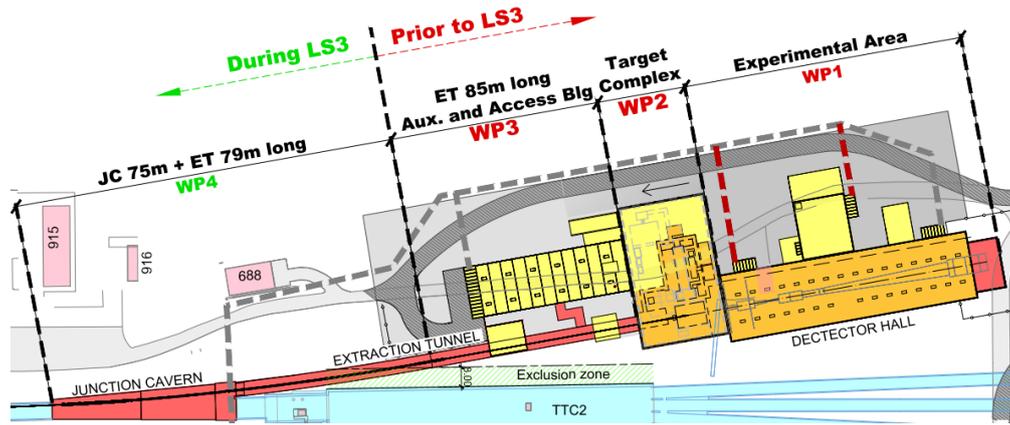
CE work package breakdown. Underground structures in red; surface structures in yellow; below ground component in orange; existing structures in blue. JC – junction cavern; ET – extraction tunnel.
